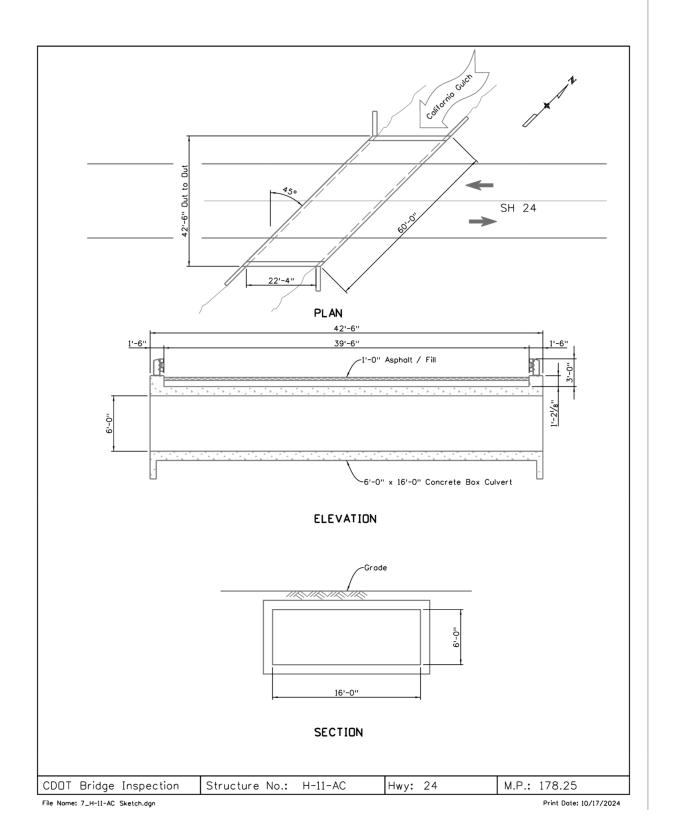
Culvert Inspection Sketch – Example 7
